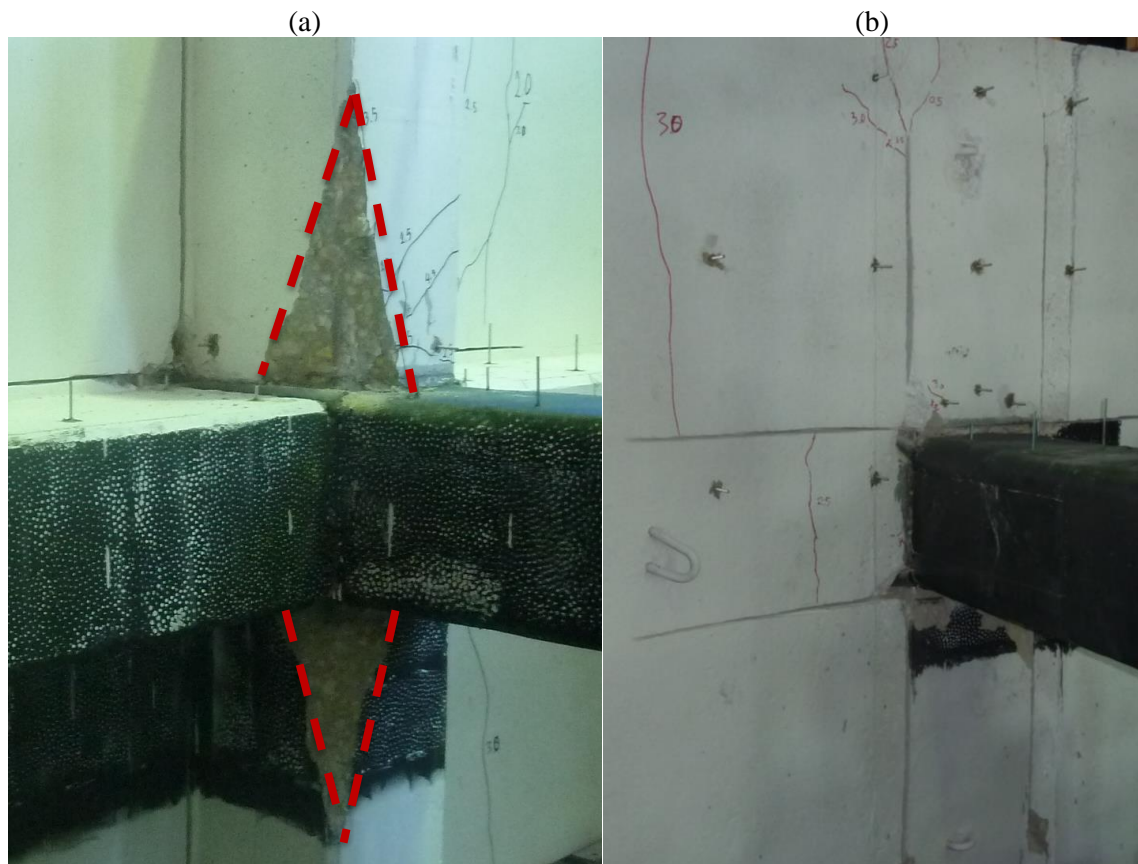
(a) Damage in the transverse beam with concrete wedge spalling indicated in red; and (b) cracks in the top of the slab for specimen C1-RT-A-sw.
